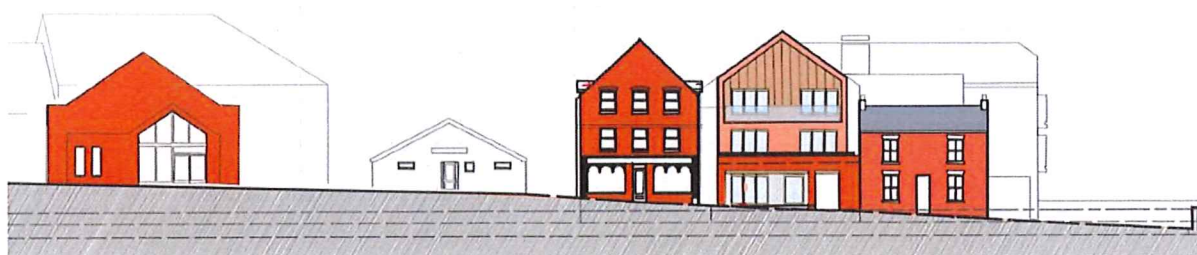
New Elevation inserted between listed New Market House & Gavel House takes its geometry from existing street elevations
